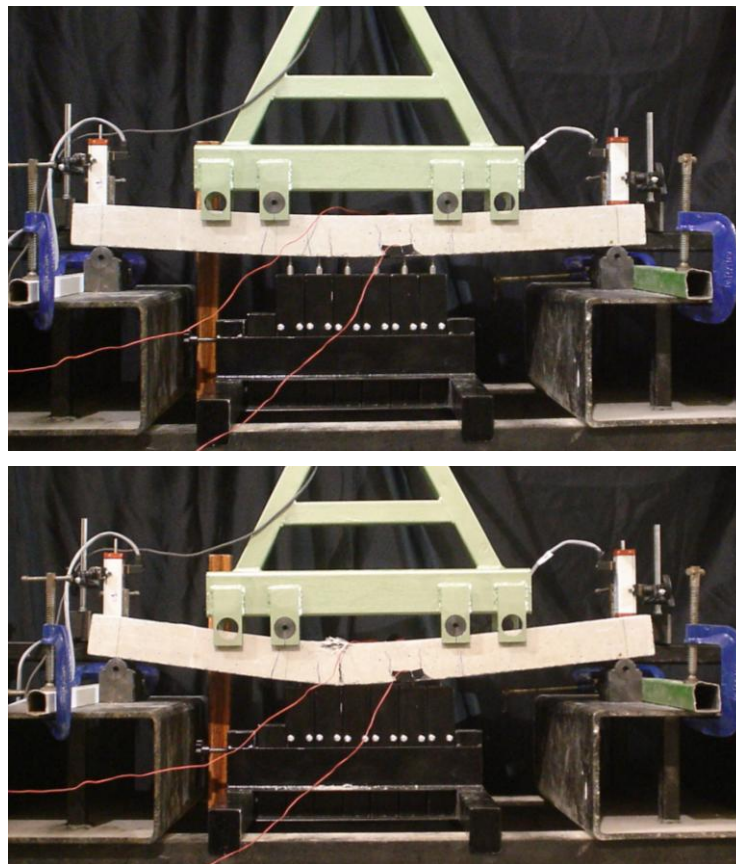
Cracking pattern of concrete with bending reinforcement and steel fiber (*ws-sfrc*)
